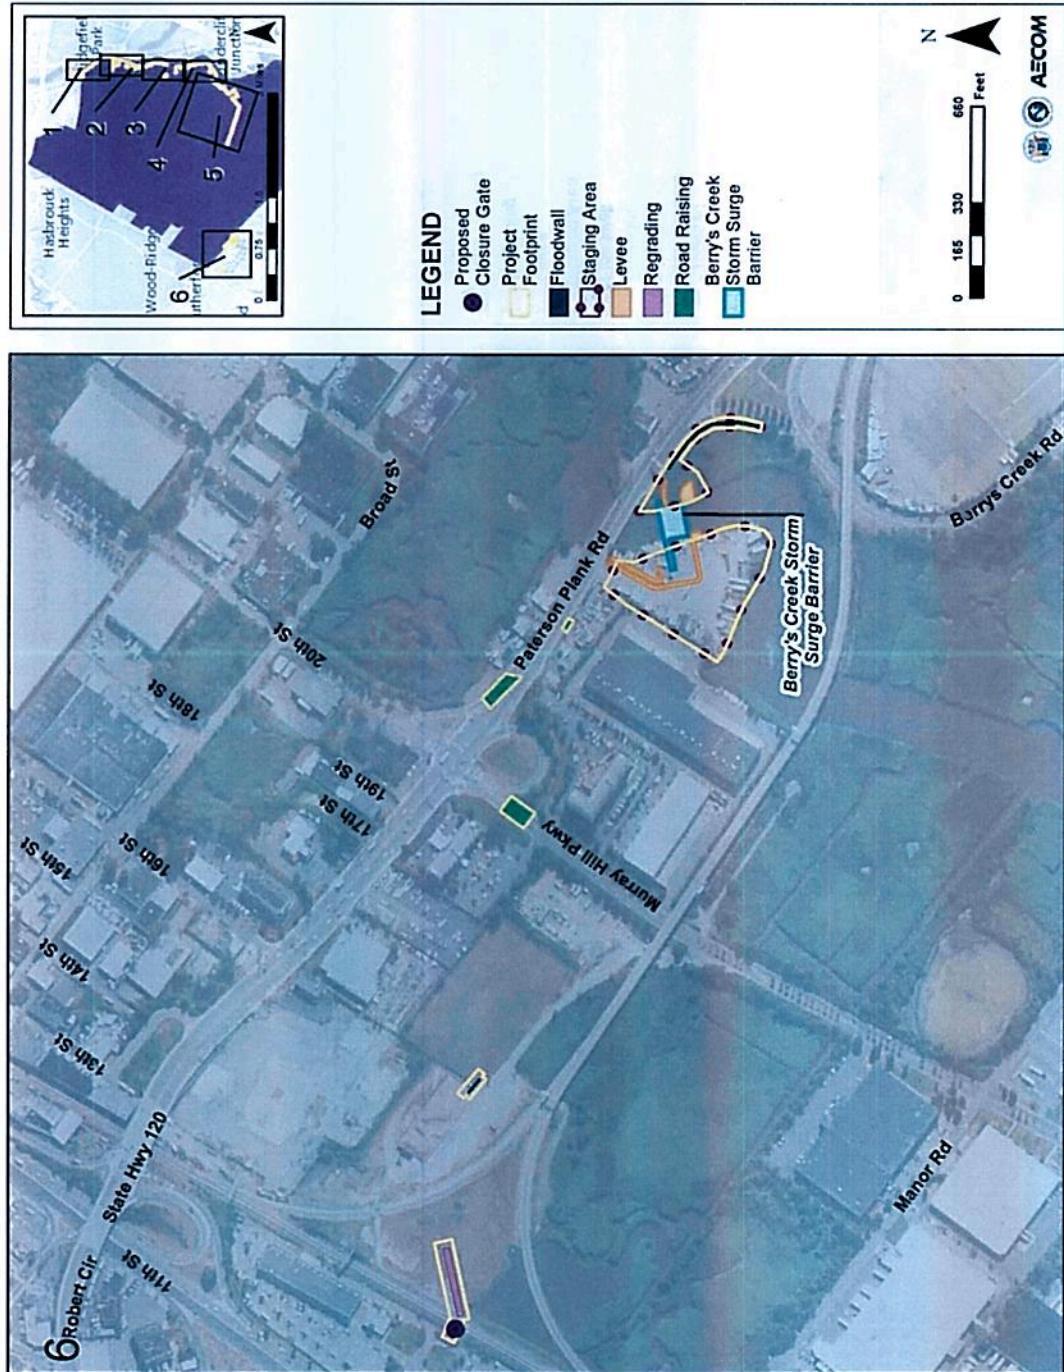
Alternative 1 LOP (Berry's Creek Storm Surge Barrier; Figure 4 of 4)
